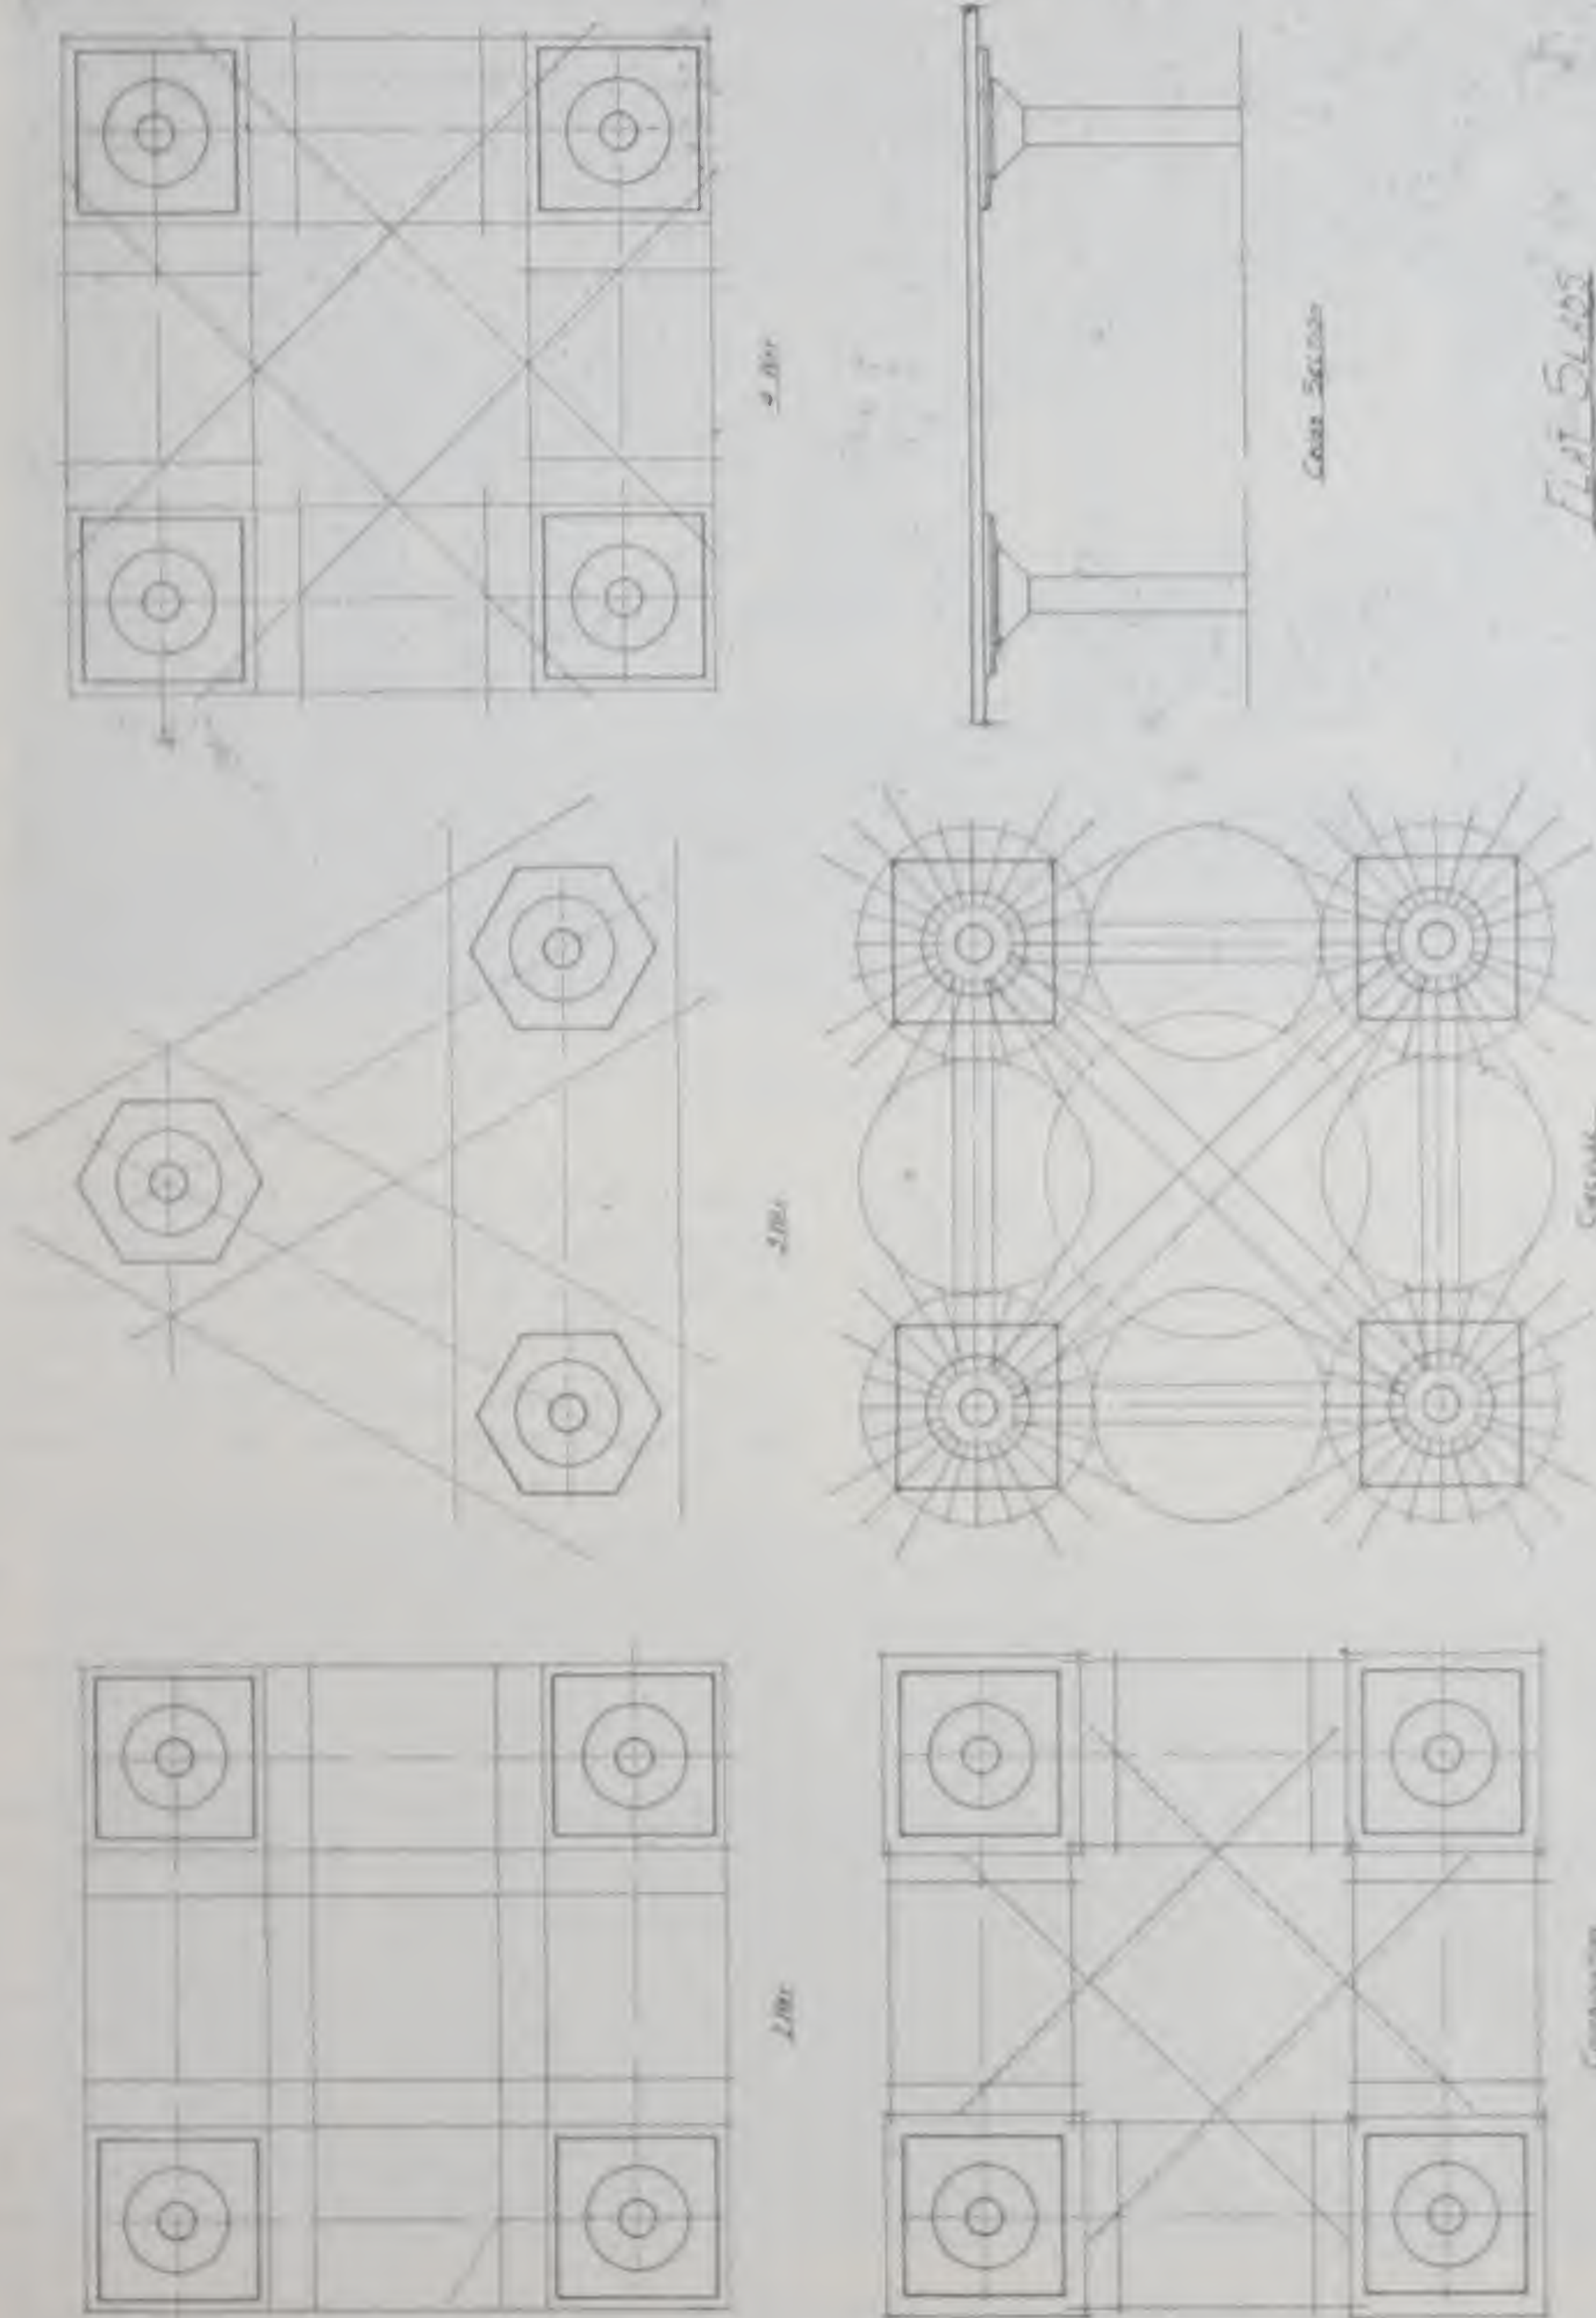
SEVERAL TYPES OF REINFORCING MAY BE USED IN FLAT SLAB CONSTRUCTION.
